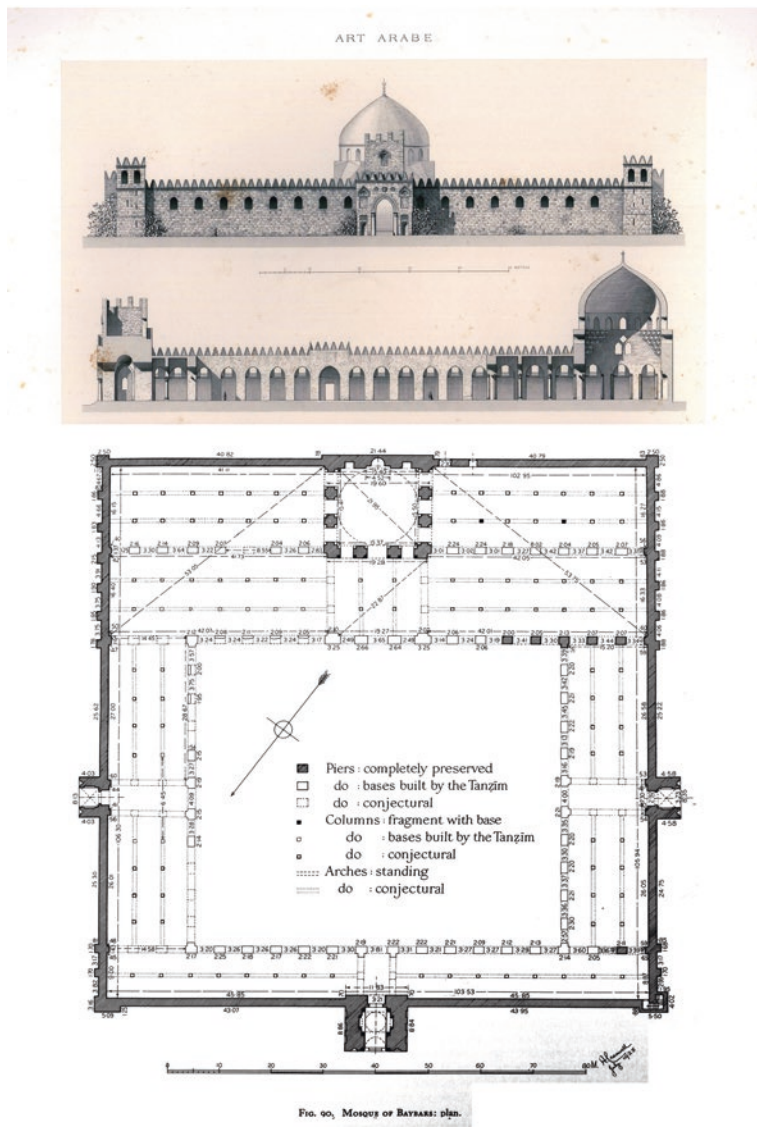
Mosque of Sultan al-Zāhir Baybars, Cairo. (a) Elevation and section after Prisse d'Avennes 1869–1877. (b) Floor plan after Creswell (1978)
